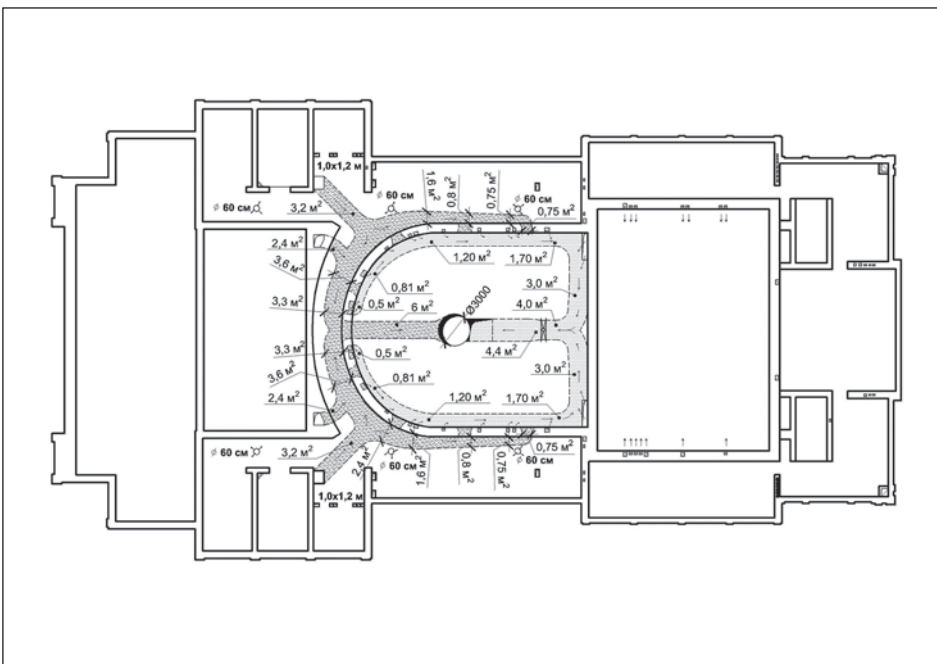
Heating and ventilation system of the theatre – plan of the loft [6]
